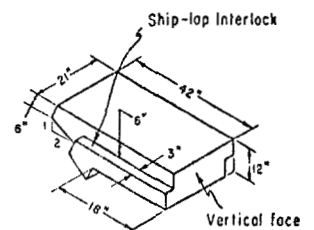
STEPPED TYPE INTERLOCKING PRECAST CONCRETE BLOCK SEAWALL
